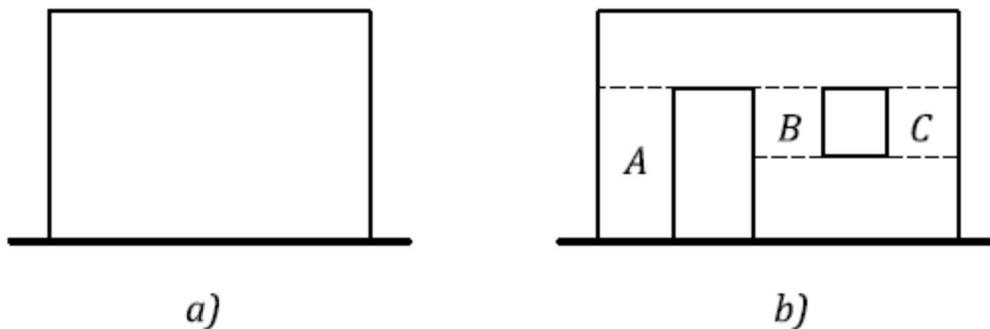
Masonry shear walls: a) solid, and b) perforated.
